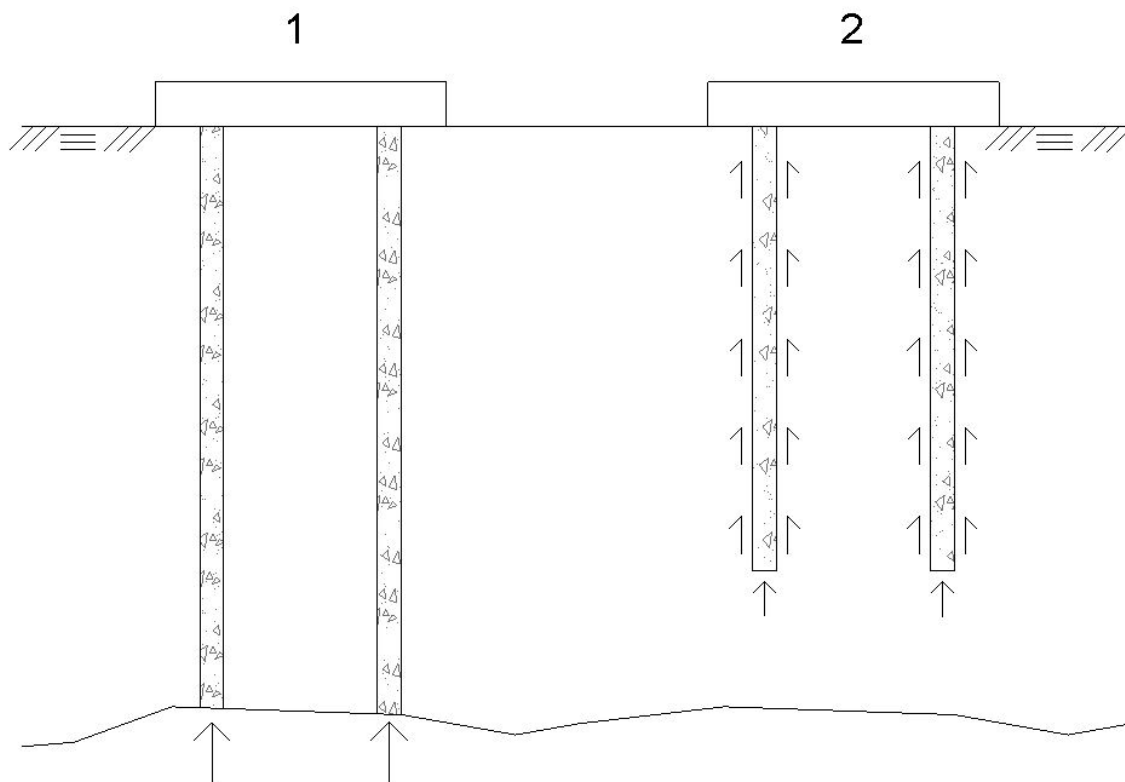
Principle of common pile foundations. 1: End-bearing piles, 2: Floating piles.
